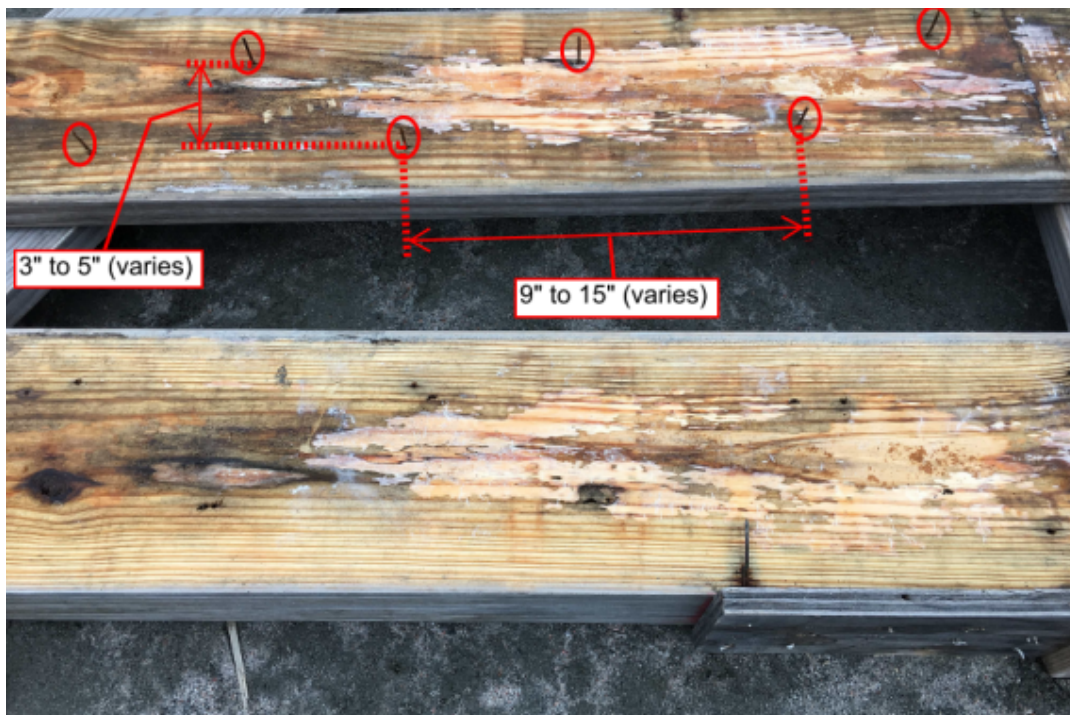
Typical nailing pattern used to build up falsework tower leg member
